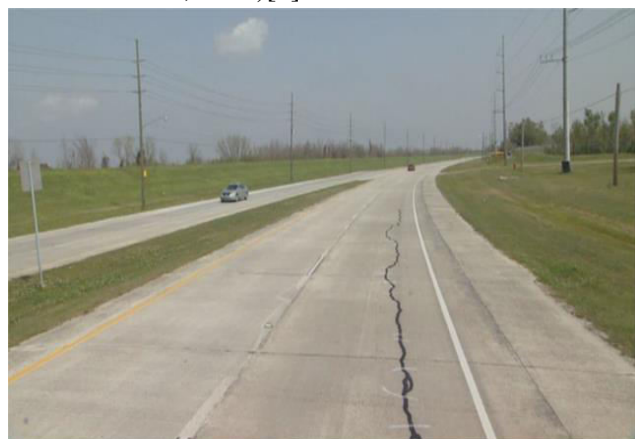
Typical examples of longitudinal cracking of JPCP pavements in Louisiana (Danny X. Xiao,2018)[5]
